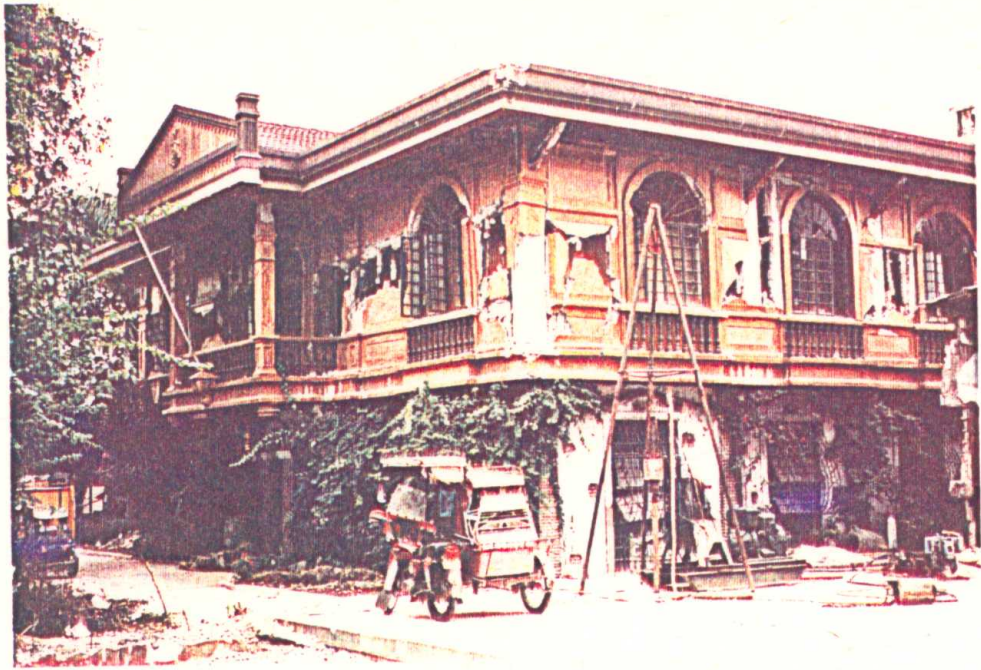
Heavily damaged 2 story r.c. frame building of the Museum at Agoo. Dominant nonstructural damage of facade and infill masonry walls.
